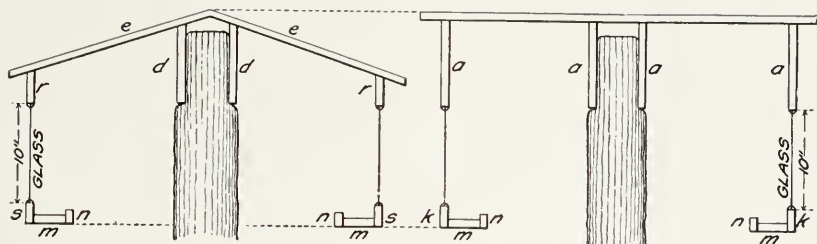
CROSS AND LONGITUDINAL SECTIONS OF FOOD HOUSE SHOWN IN FIGURE 5.
